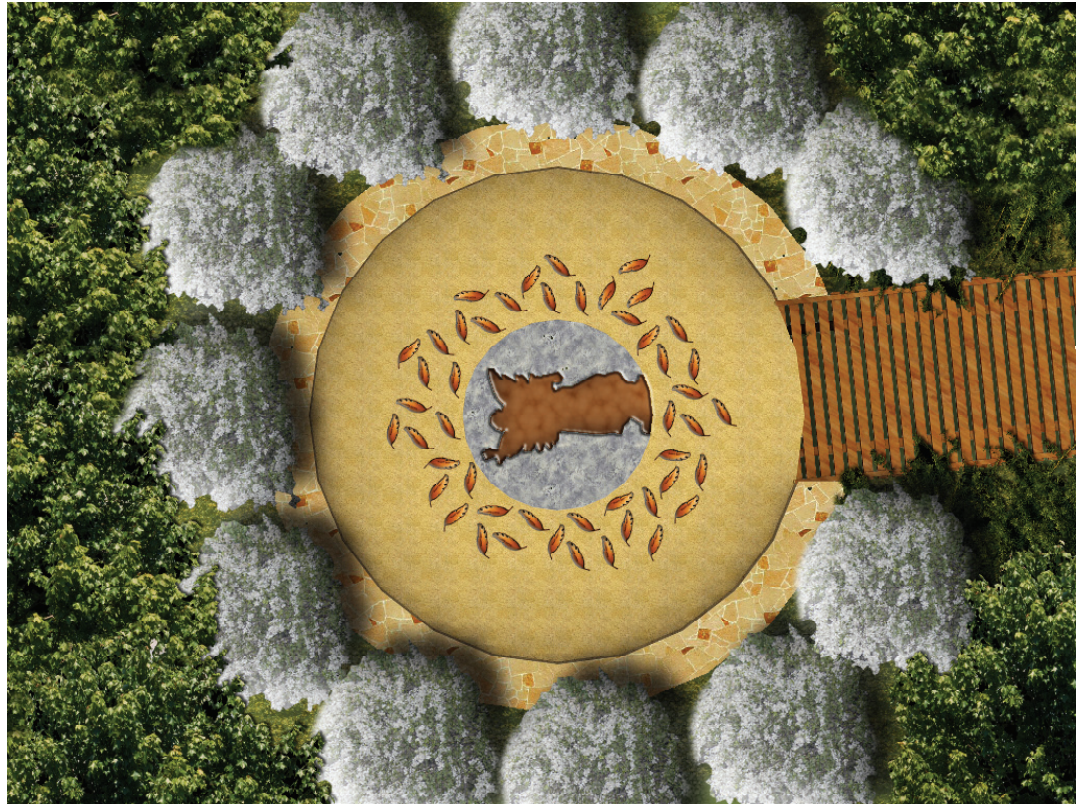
Camp Angel Memorial plan. (Amanda White)
